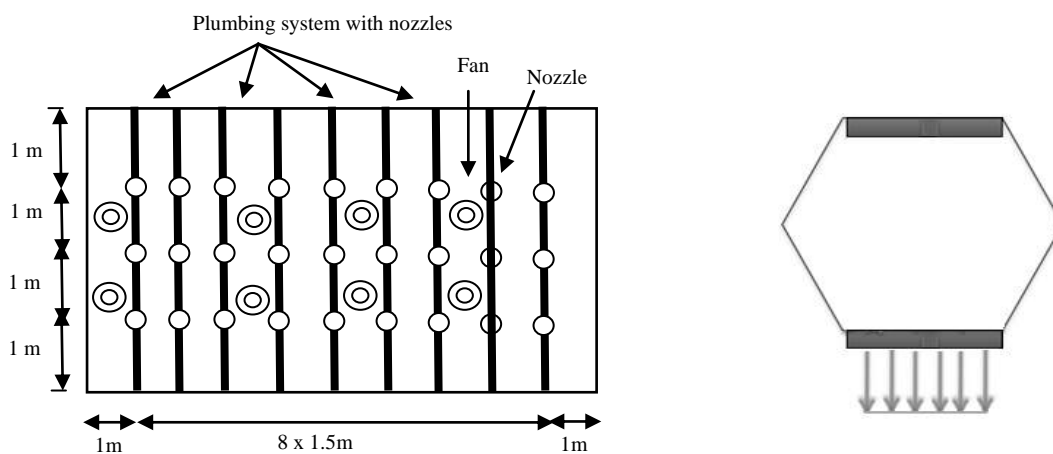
Schematic drawing designed WDR testing arrangement (not the scale) at the WindEEE
